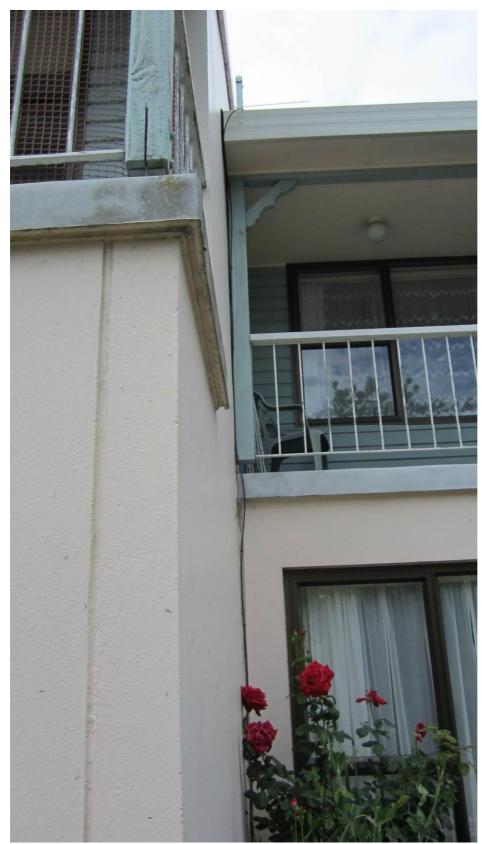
Centre precast concrete wall panel of Block B (view from north).Damage Description: Tilt and residual movement of precast reinforced concrete wall.
